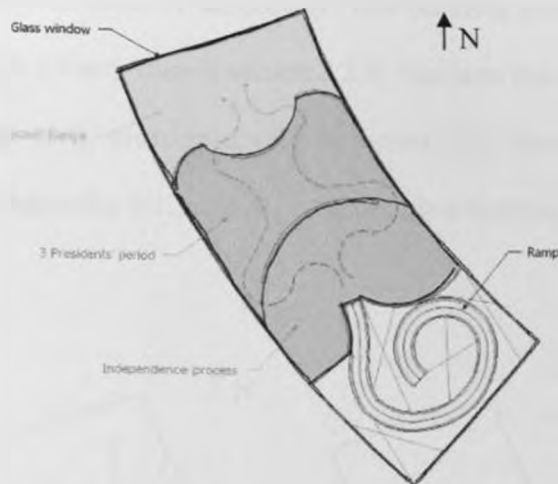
12 – Exhibition building first floor layout. The three major sections and the glass wall. Source: Author, 2013.
